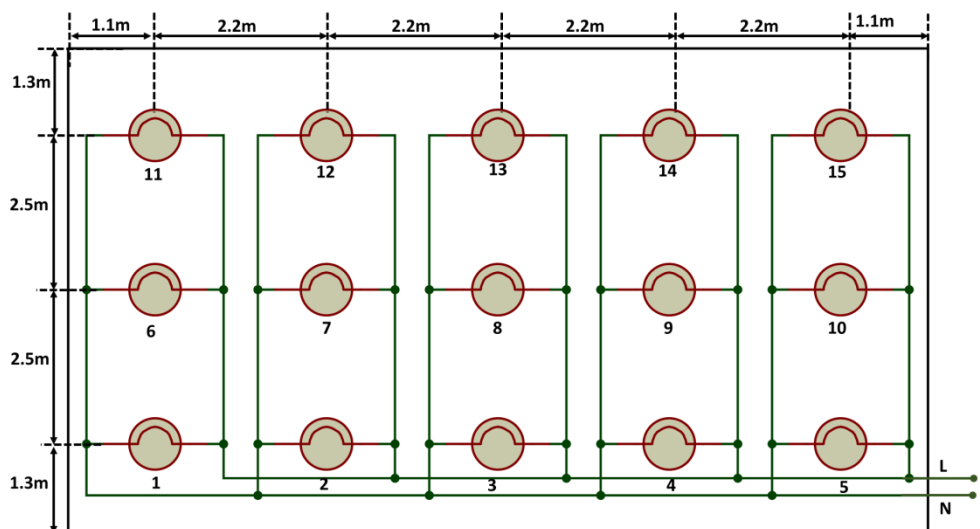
Arrangement and connection of 15 LED panel lights on the ceiling
